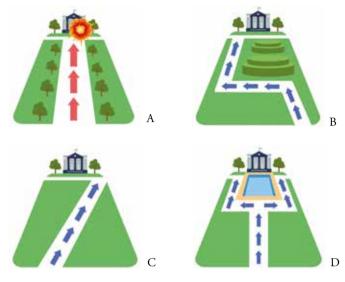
Preventing VAW attacks through access road design. Access road runs straight ahead (A), twisting access road and natural obstacles placed on the axis of the road (B), offsetting the access road in a 'diagonal' position (C), placing an obstacle, such as a body of water, on the axis of the access road (D).
